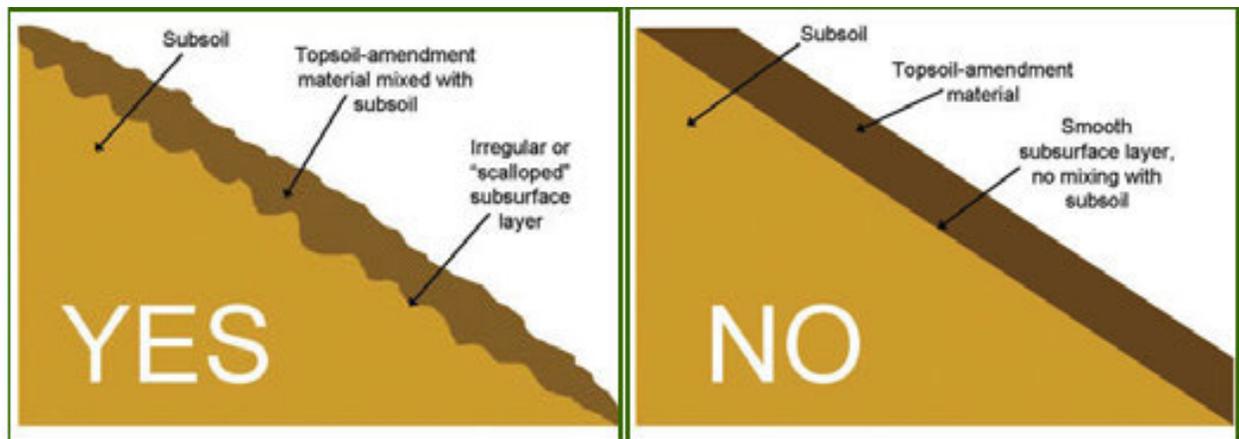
Topsoil amendment applied and mixed with subsoil, creating a scalloped subsurface layer (left). Typical topsoil amendment application without mixing with subsoil (right). Source: Watershed Management Guidebook (Drake & Hogan, 2013).<sup>1</sup>
